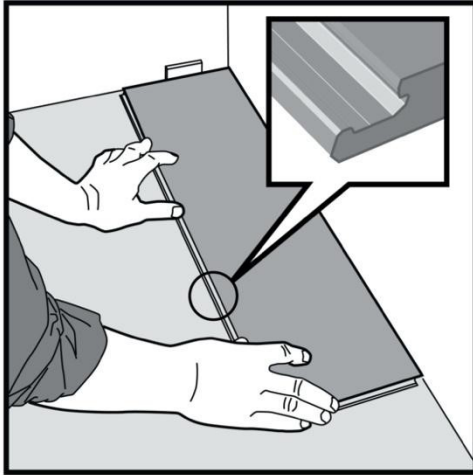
Prior to installation, measure the width of the room to decide if the first row should be cut length wise to equalize the widths of the first and last rows. See also fig 12. Turn the tongue side of the plank to face the wall. Maintain a gap of 5/16" (8mm) on the short side. Spacers can be used to make sure that the gaps are correct around the installed flooring. After 3 rows, adjust the long side so that the planks are 5/16" (8mm) from the wall. After 3 rows have been clicked together, reposition the flooring against the front wall keeping a gap of 5/16" (8 mm).
